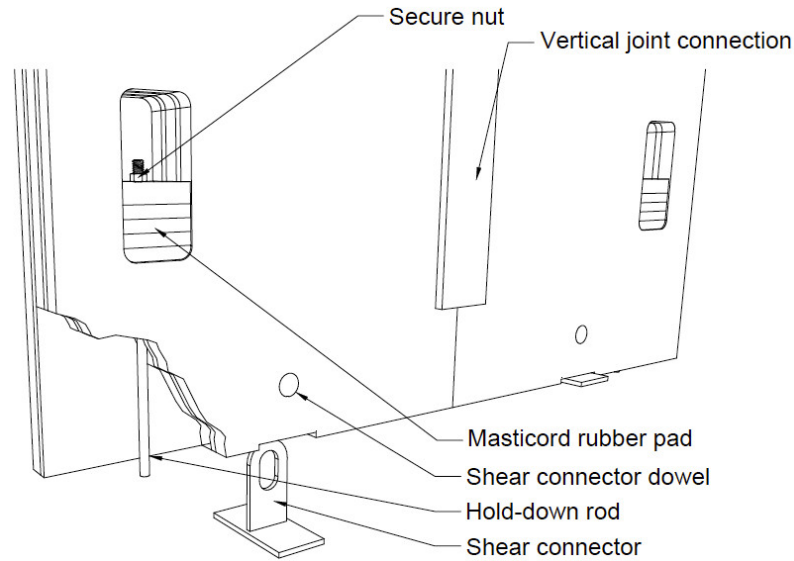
Layout of hyper-elastic hold-down in a CLT shear wall
